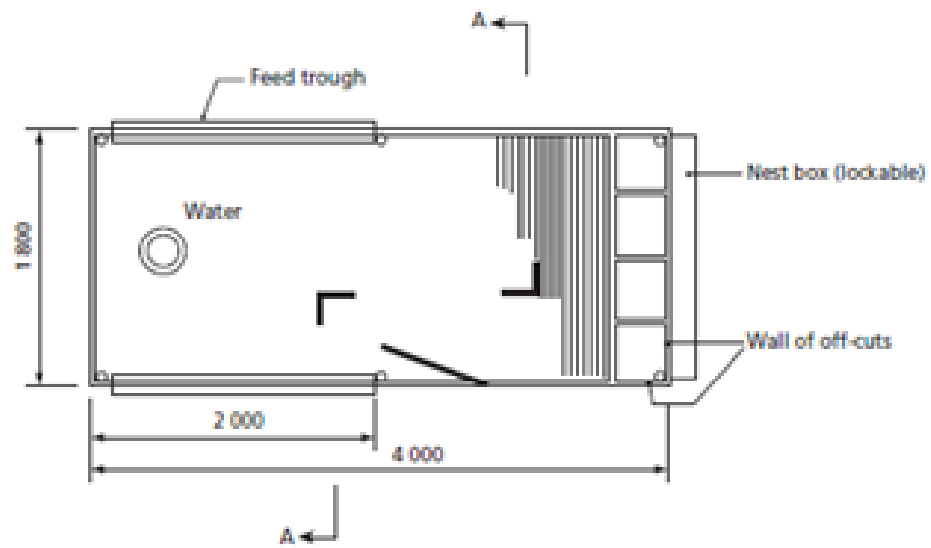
Deep-litter house for 130 layers (or 350 broilers): note the solid wall facing the prevailing wind
